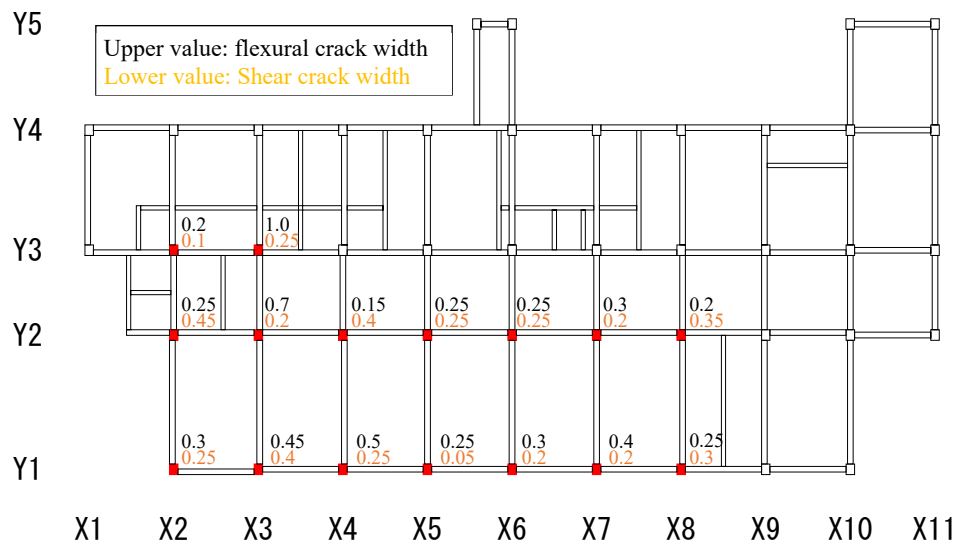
Damage of Column on first floor (Second investigation, student team)
